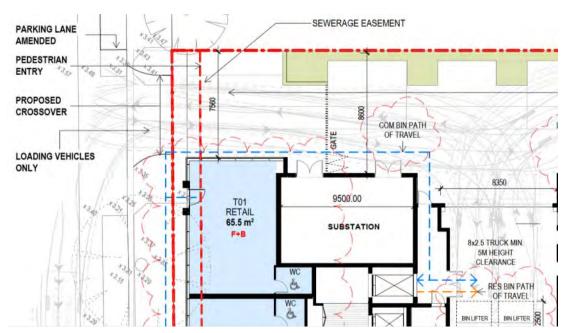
Ground Floor Plan extract showing swept paths adjacent to the substation entry
